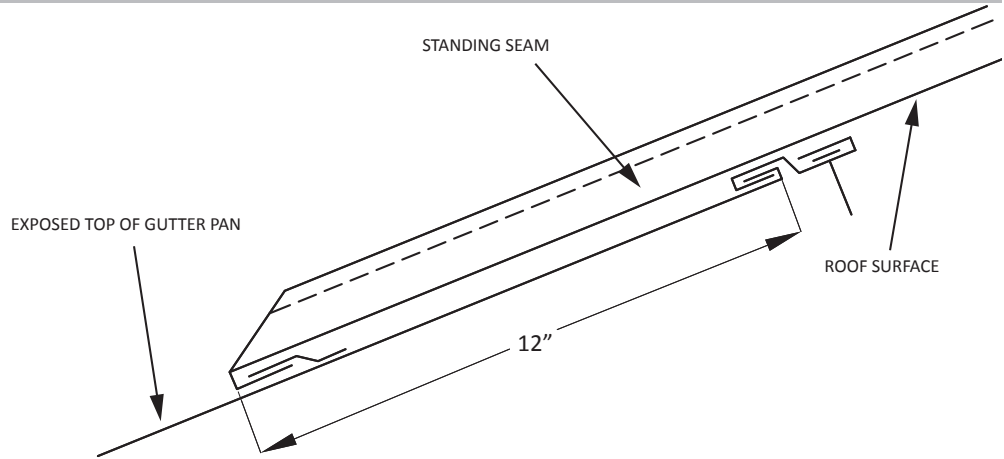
Proposed Treatment Detail at Transition Between Built-In Gutter and Standing-Seam Roofing. Waterproof method of providing a water tight standing seam roofing system. Starter strip at transition from gutter pan to standing seam is soldered to the gutter pan 12 inches below the high point of the gutter pan.
